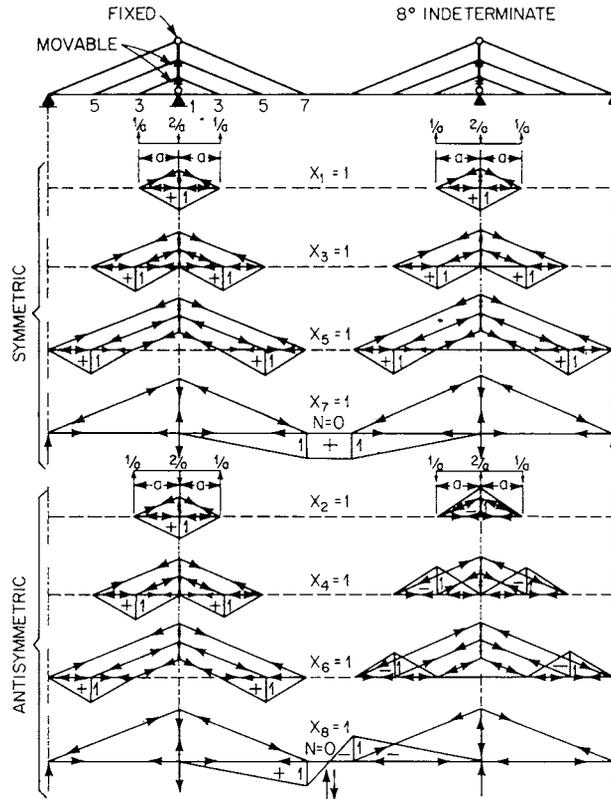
Forces induced in a cable-stayed bridge by independent symmetric and antisymmetric group loadings. (Reprinted with permission from O. Braun, "Neues zur Berechnung Statisch Unbestimmter Tragwerke," *Stahlbau*, vol. 25, 1956.)
